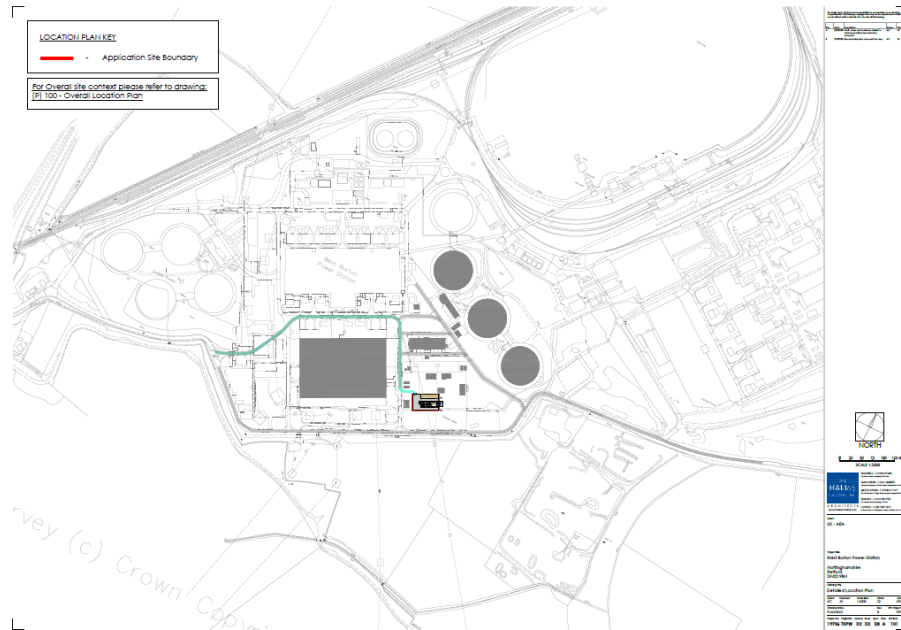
Detailed Location Plan Extract – Harris Partnership (not to scale)
